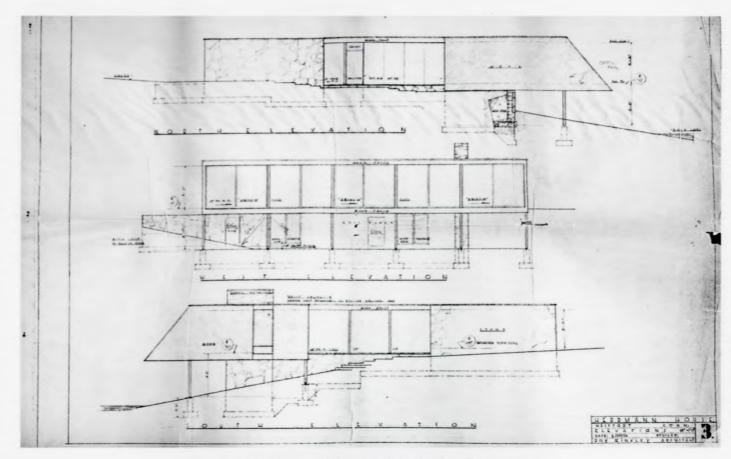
Allen House. Westport, Fairfield County, Connecticut Elevation, May 20, 1956, Leroy Binkley
